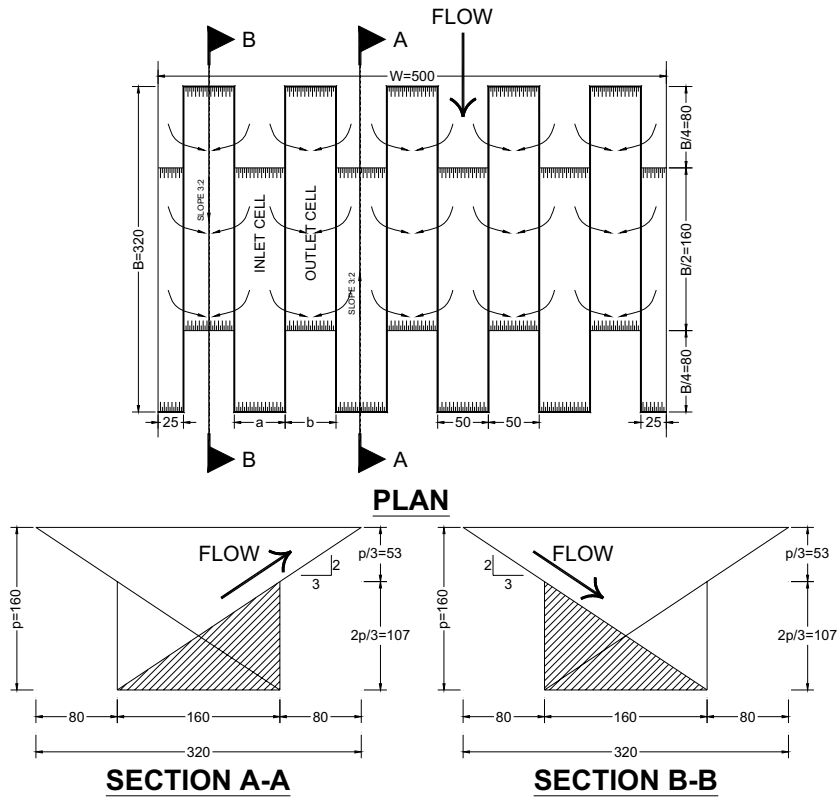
Plan and section of model P₂M₂ (both sides ramping), (dimensions in mm)
